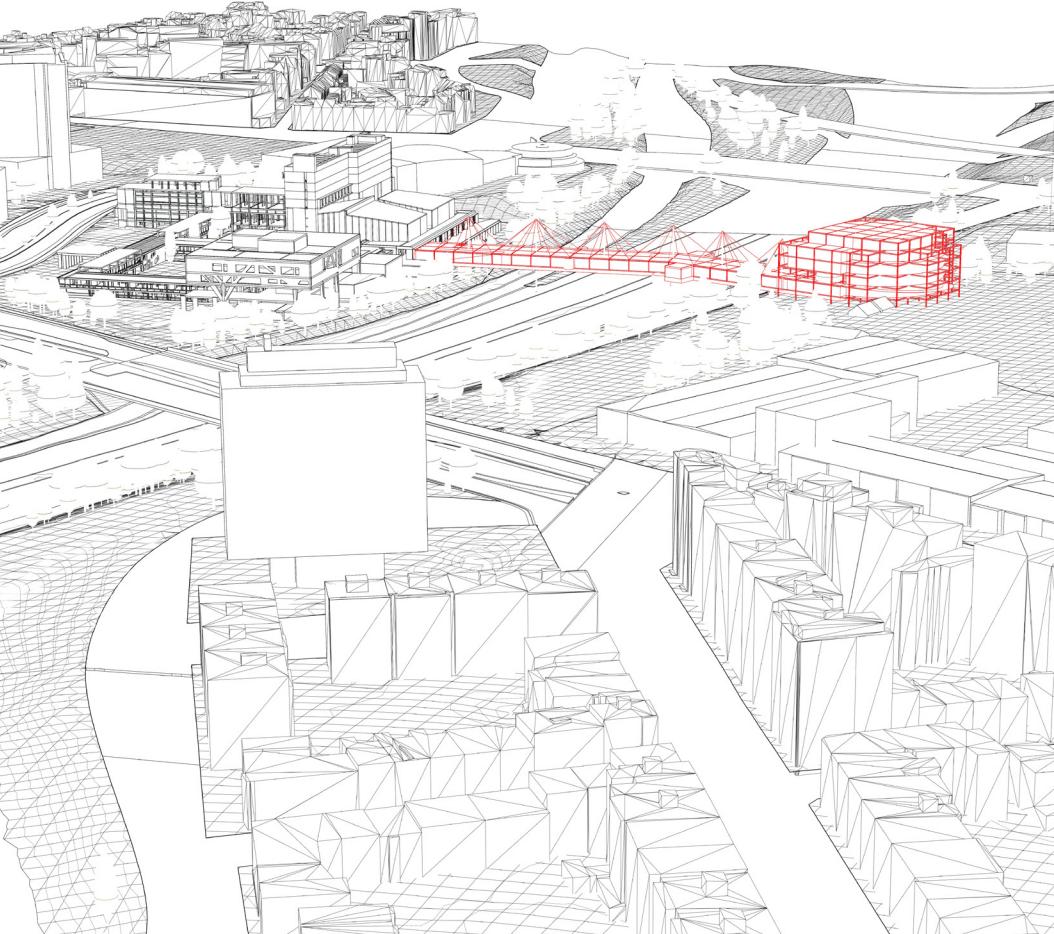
axonometric of the bridge and bridgehead as extension of desingel from the back of bp building, liren
